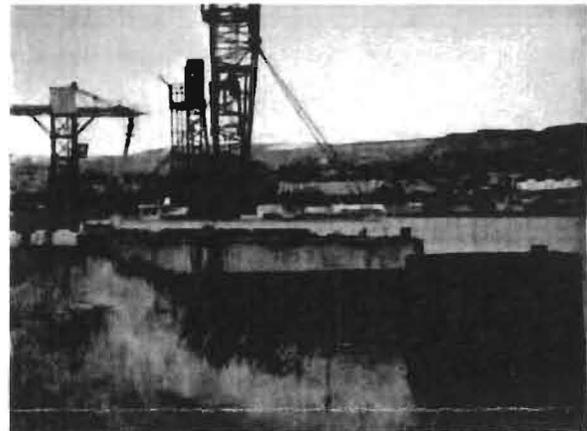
Photo looking southeast upstream of the Clearwater River at west end of the Port of Lewiston Dock. Notice the large crane used for loading and unloading ships depicting heavy industry.
